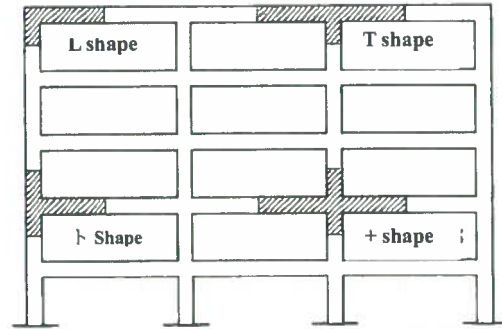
Classification of Beam Column Joint (Figure 8.3.2 of Design Guidelines*)
